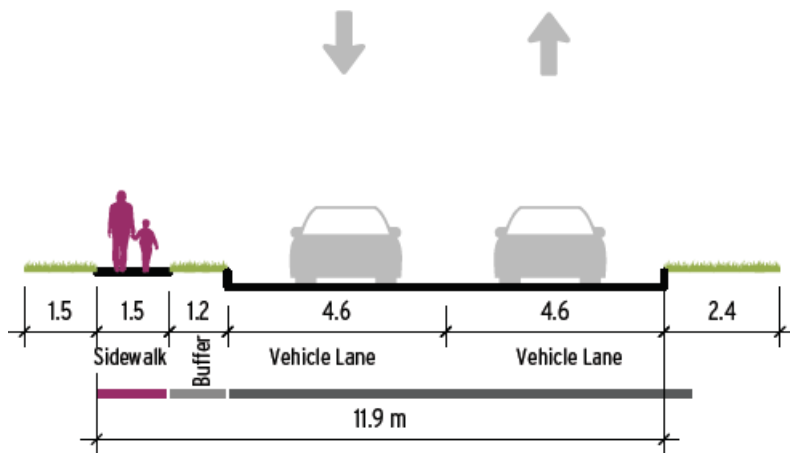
Treaty Trail & Truro Heights Road, Existing Cross Section
